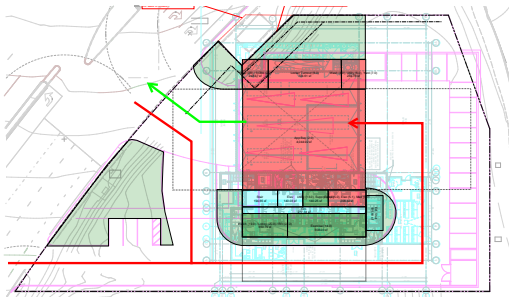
Concept sketch - building anchored in landscape and opening to the community
